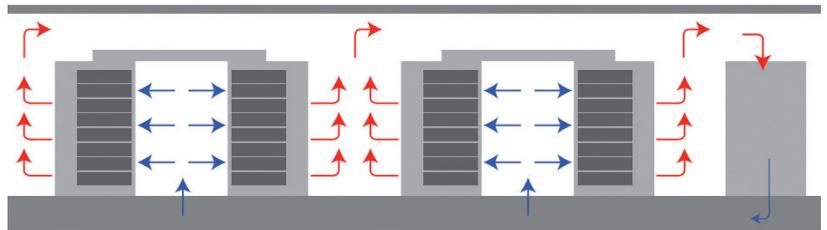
Sectional view of a CAC solution with ceilings constructed over the cold aisles showing airflow into the contained aisles and through the cabinets and back to the cooling units through the room. Note: Hot exhaust air is isolated within the room by the ceilings over the contained cold aisle.
